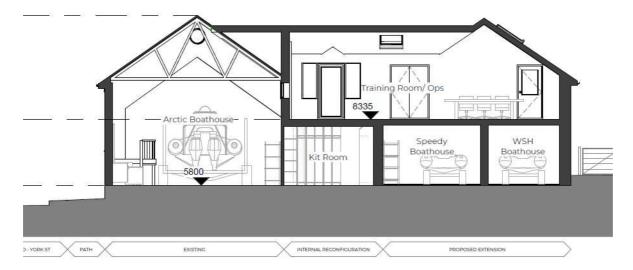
Section through proposed extension. Drawing by Studio Four Architects
